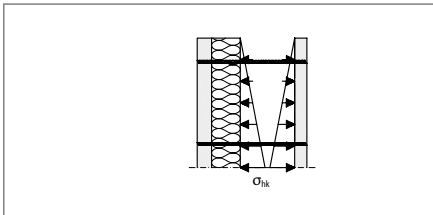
Schöck Isolink® type TA-H, TA-HC: Load case fresh concrete pressure; element wall in the construction state
